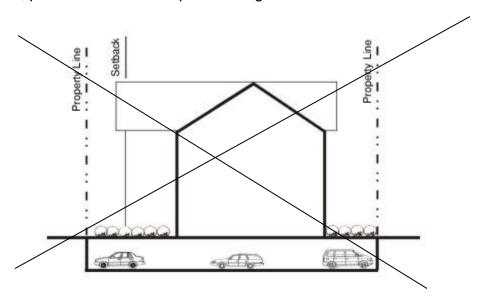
Figure Exception to 20.50.130(1): Diagram of multifamily structure with underground parking within a required setback.
